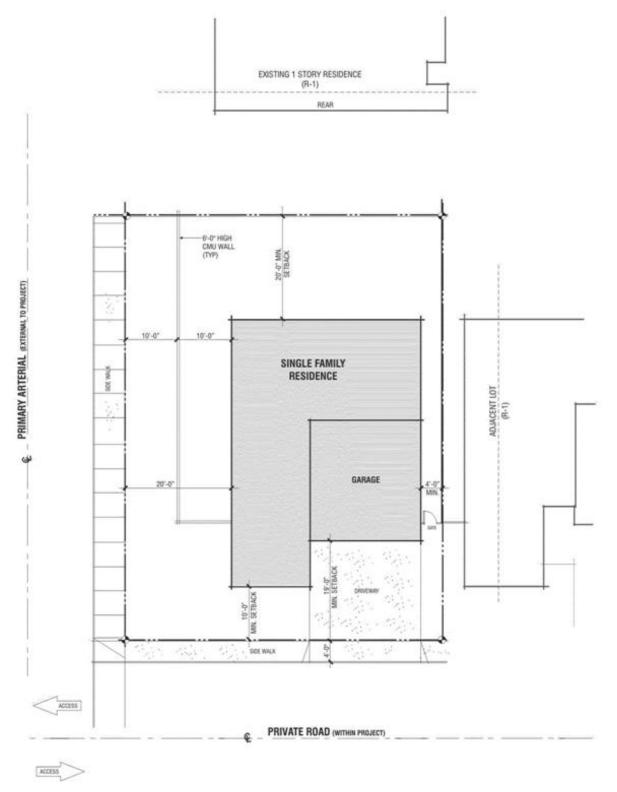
Diagram indicating building setbacks for the following: dwelling rear yard setback adjacent to a
